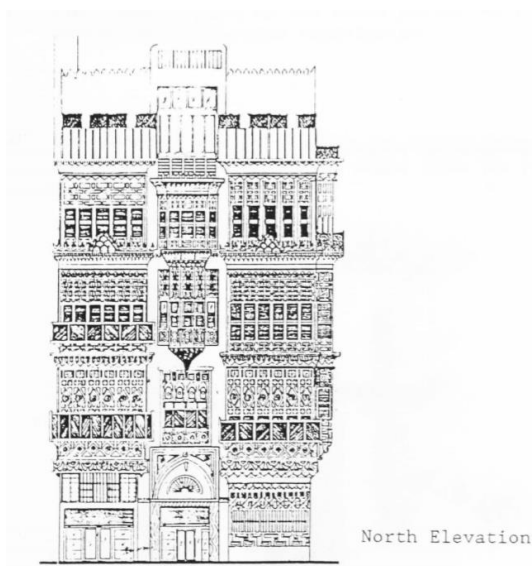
North elevation of the traditional house (Al-lyali, 1990)
